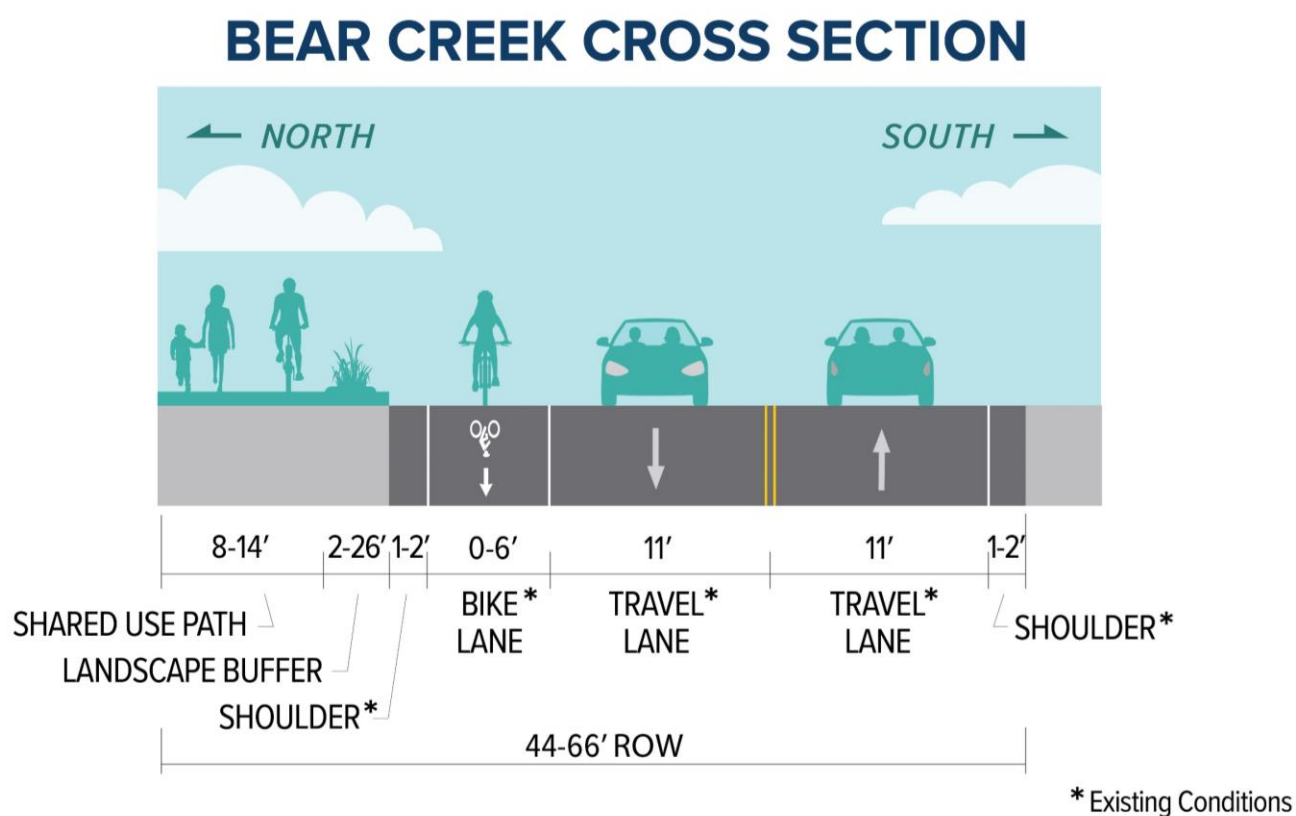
BEAR CREEK ROAD PREFERRED ALTERNATIVE CROSS SECTION
